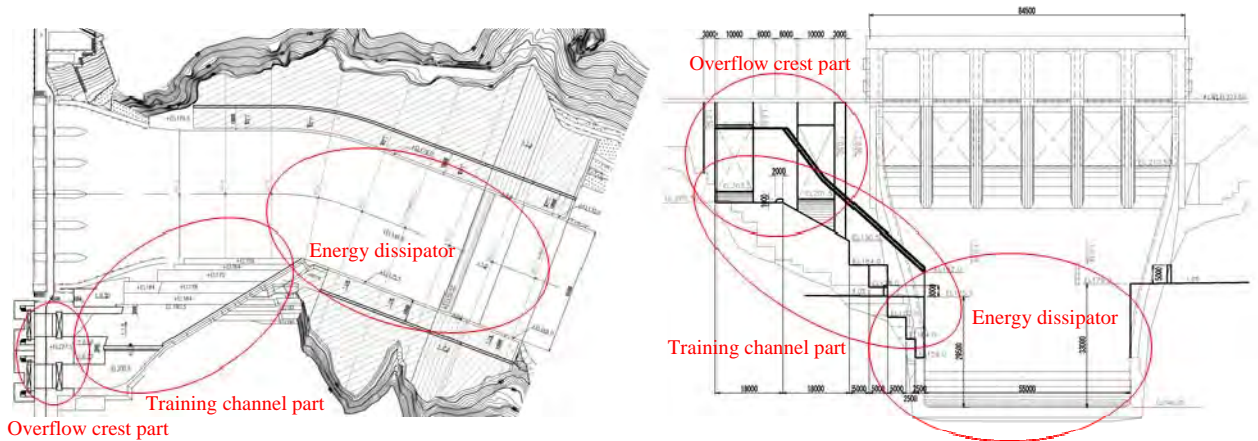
Plan view (left) and downstream view (right) of the final design shape
